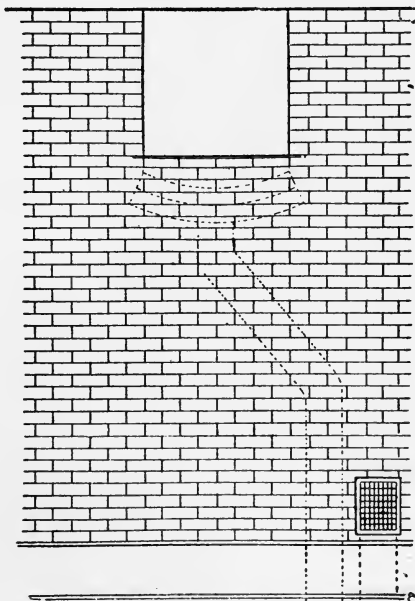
CHIMNEY BREAST AIR OUTLET.
